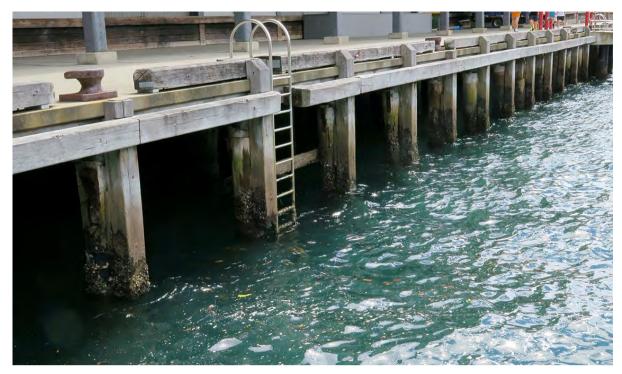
Photograph of timber piers of Pier 2/3. (Source: CRM 2016)
